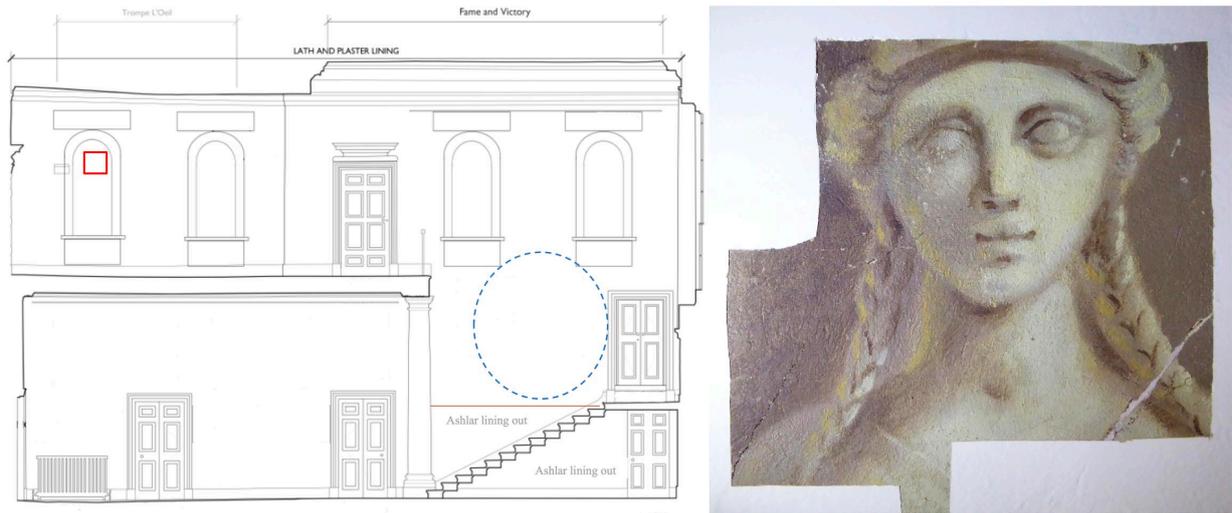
(above right) A section of trompe l'oeil painting within the outline of the niche, depicting a female figure, and (above left) an illustration indicating its location on the North wall of the upper landing (not to scale). Architectural drawings supplied by Purcell, architects to Stowe House Preservation Trust © Hirst Conservation Ltd
